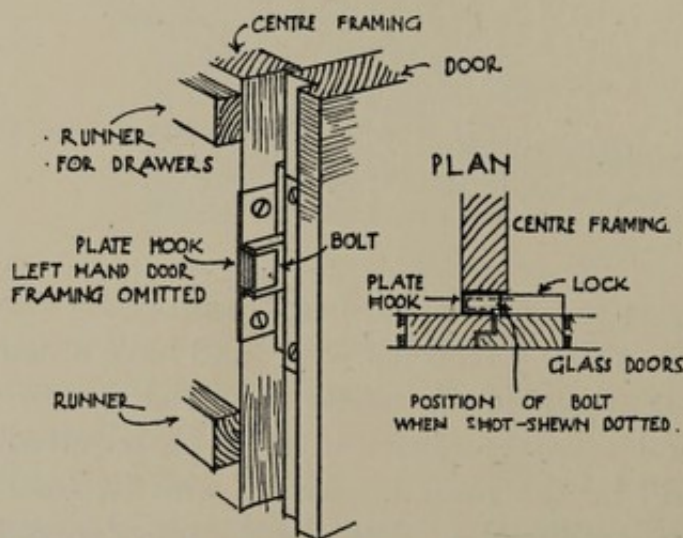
Lock to Pair Door Cupboards to render Bolts unnecessary, Geological Department, Imperial College, London.
